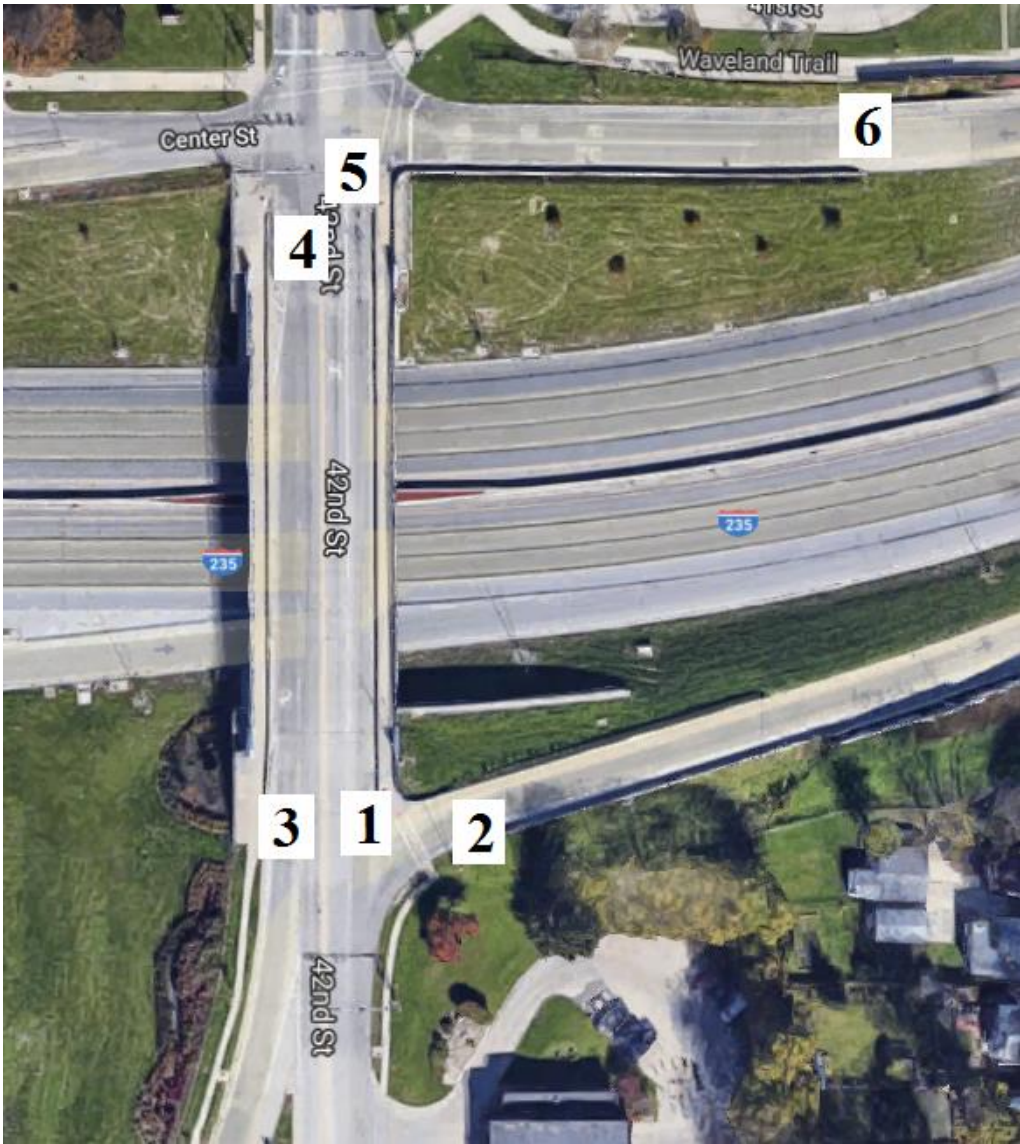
Bridge No. 7705.4O235 with Sloped End Treatments Labeled [1]
